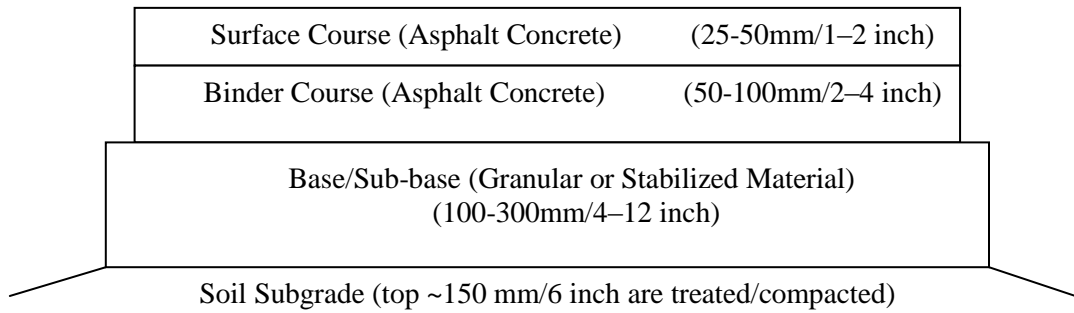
Typical Cross Section of Conventional Asphalt Pavement
